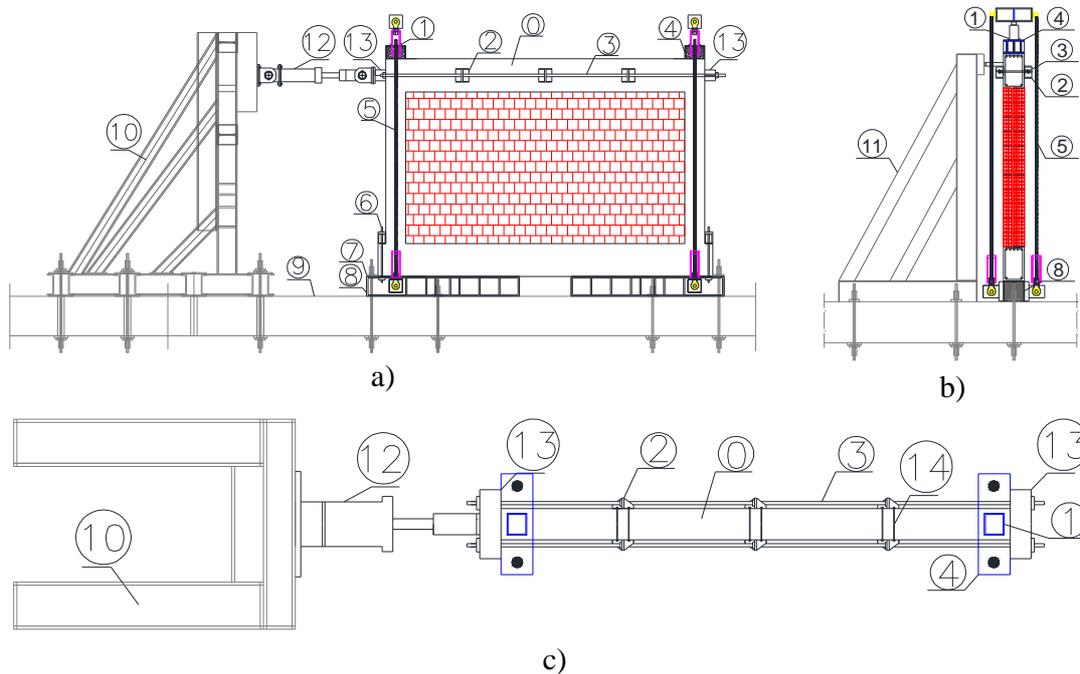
Layout of the in-plane experimental test set-up: a) Front view; b) Lateral view and c) Back view. 0 – Top beam, 1 – hydraulic jack (for axial load application), 2 – steel plates for horizontal force distribution, 3 – horizontal high-strength rods ($\phi 22\text{mm}$), 4 – head steel shape, 5 – vertical high-strength rods ($\phi 30\text{mm}$), 6 – steel rod ($\phi 20\text{mm}$) connecting the RC frame to the foundation steel shape, 7 – high-strength rods ($\phi 30\text{mm}$) fixing the foundation steel shape to the reaction slab, 8 – foundation steel shape, 9 – strong floor, 10 – in-plane reaction frame, 11 – out-of-plane reaction and guiding structure, 12 - Servo-controlled hydraulic actuator, 13 – Right and left head steel profile and 14 - 5 – Transversal rods ($\phi 12\text{mm}$).
